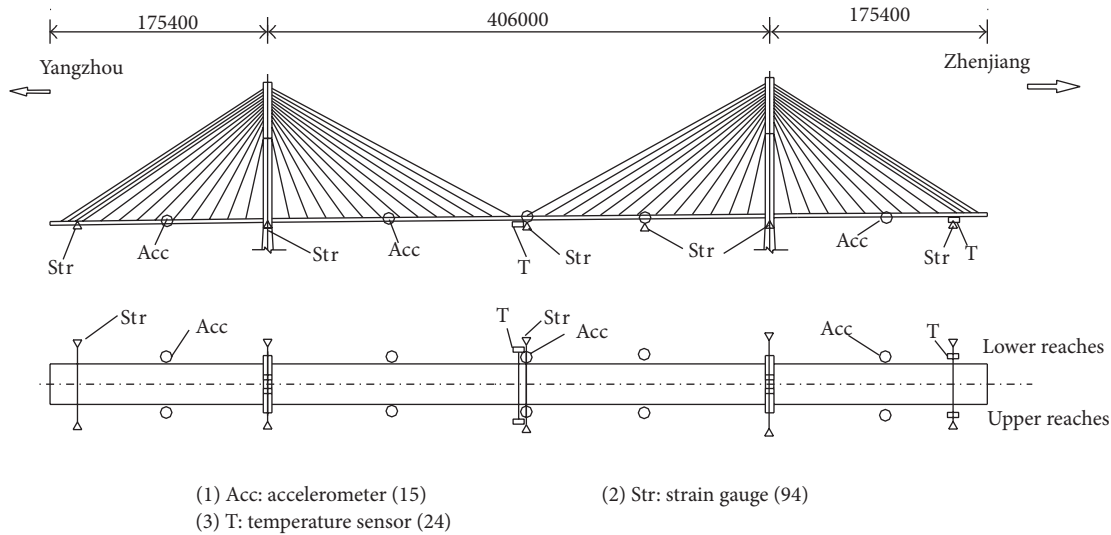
Layout of sensor system of RCB (dimension unit: mm).
